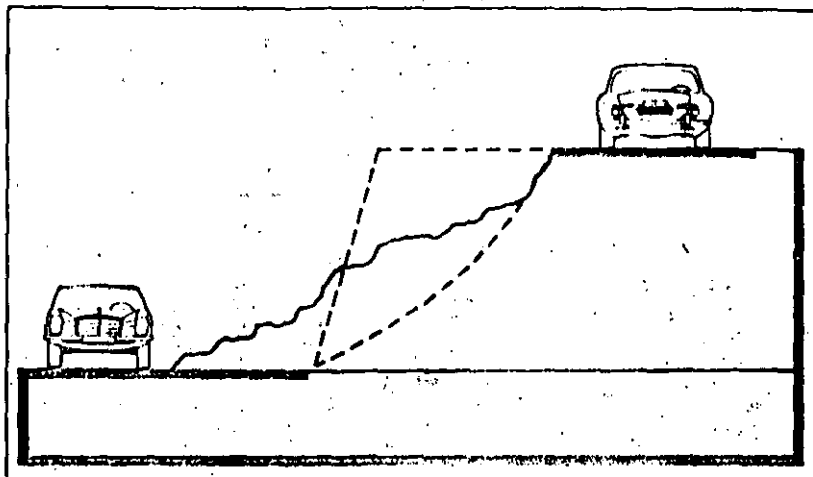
Failure mechanism of earth retaining structure, acc. Rankine
